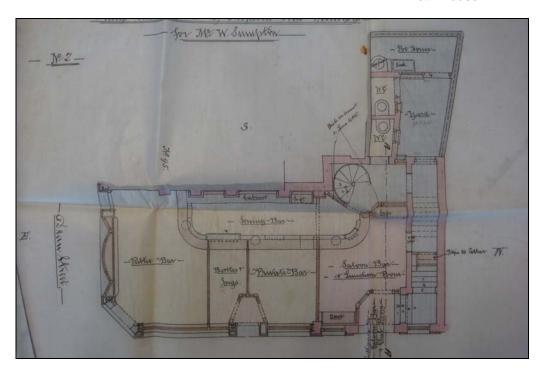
1899 plan showing proposed room arrangement in The Bath House
